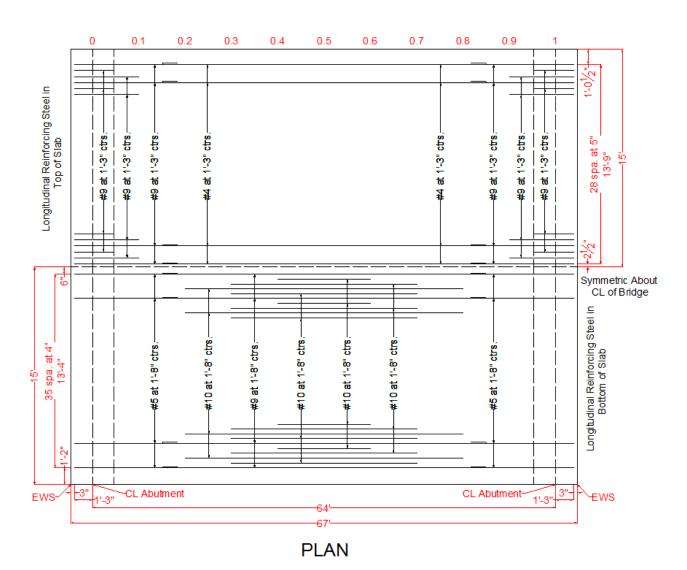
shows the reinforcement design for the 64-ft. haunched-slab section in plan view.
